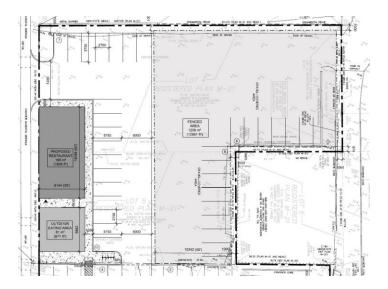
Excerpt of Site Plan Showing Proposed Development
